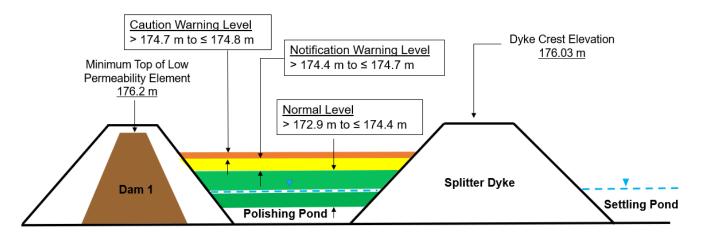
Water and Infrastructure Elevations for Polishing Pond (not to scale)
